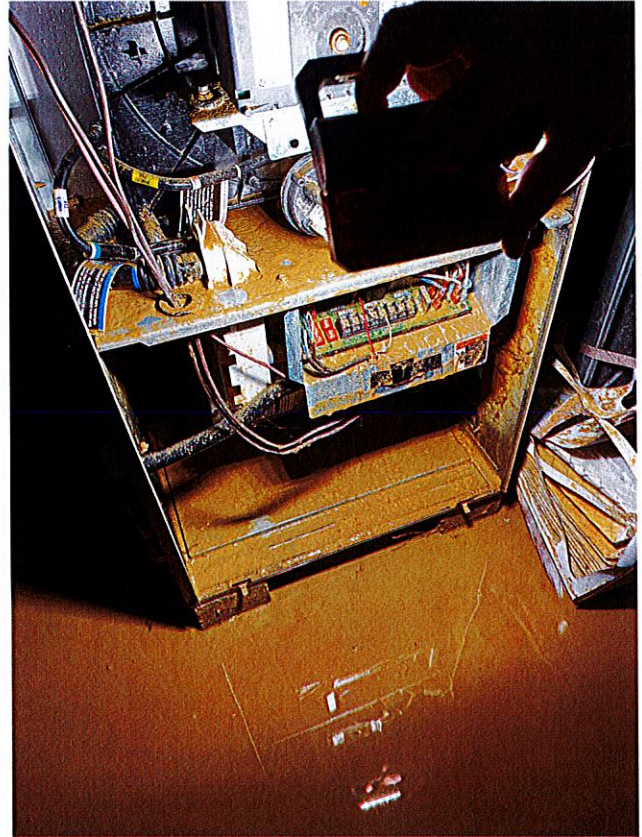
Furnace damage revealed by Burkhardt technician on March 9, 2022).
